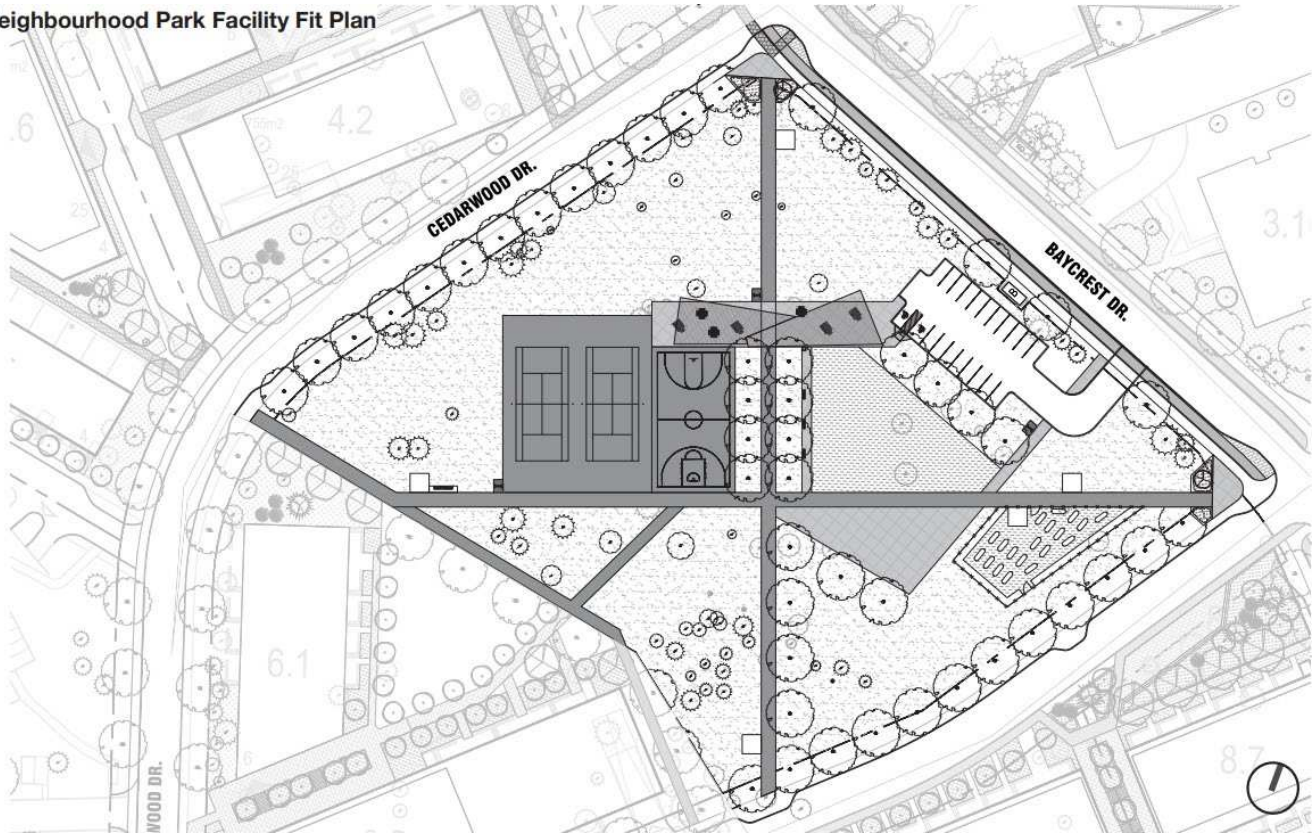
Neighbourhood Park Facility Fit Plan, prepared by Fotenn Planning + Design
